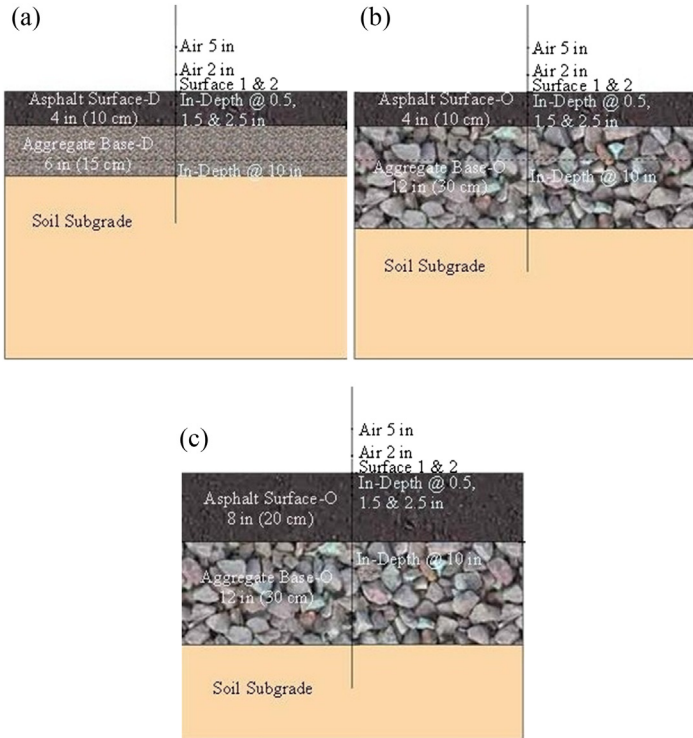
Cross-sections and sensor locations for the test sections. (a) Section B1. (b) Section B2. (c) Section B3. *Note:* D, dense-graded; O, open-graded. 1 in = 25.4 mm.
